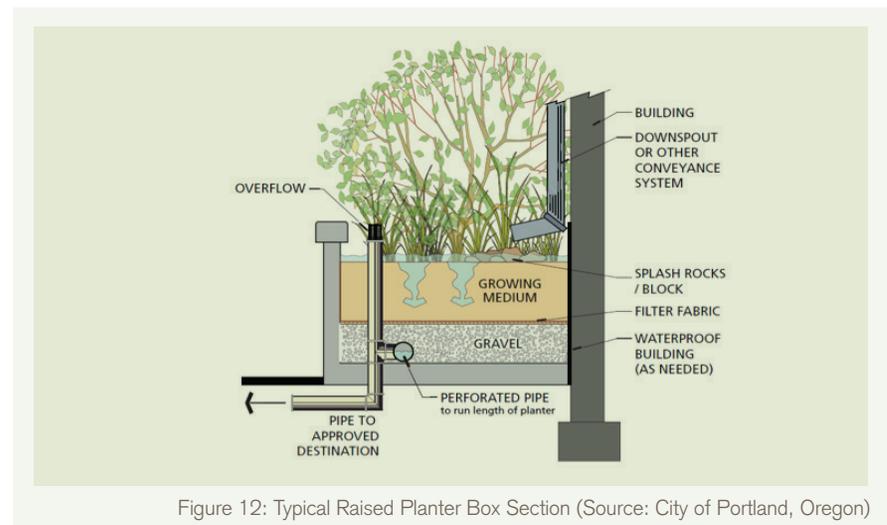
Typical Raised Planter Box Section (Source: City of Portland, Oregon)
